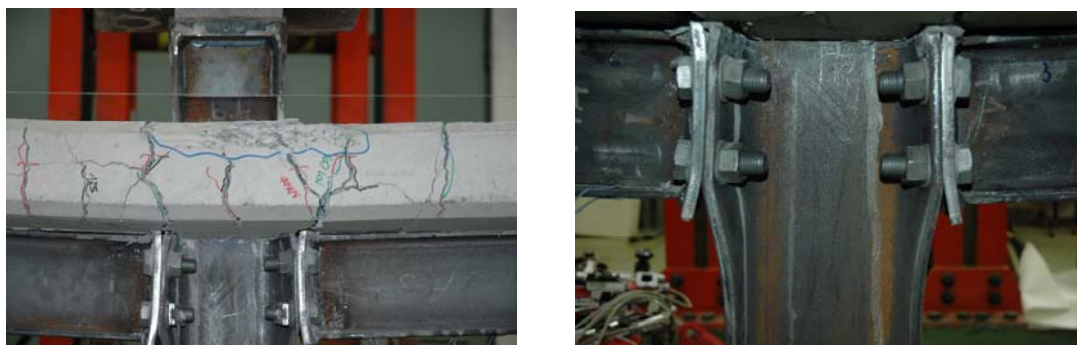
Tested specimen at the end of the test under sagging bending moment and tension load
